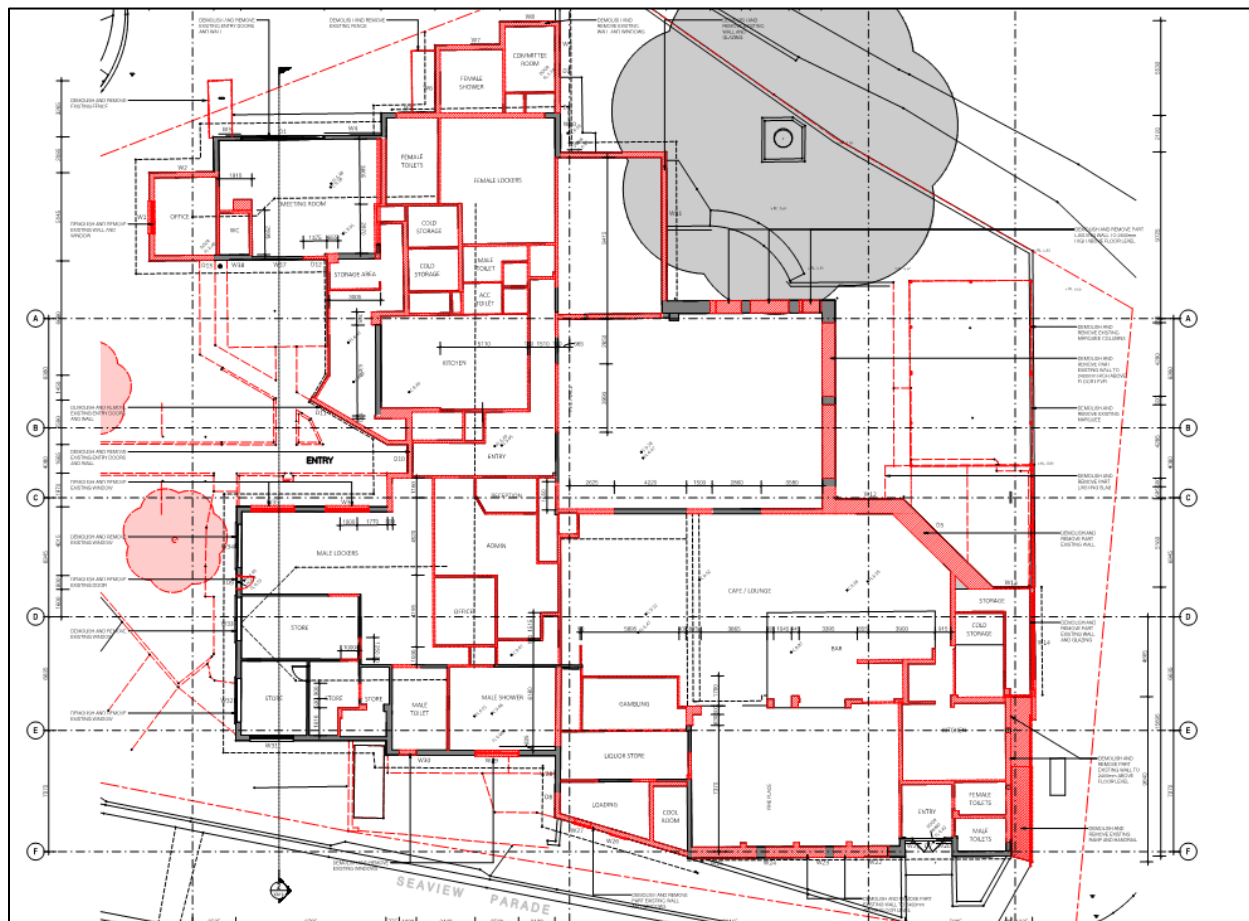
Proposed Demolition Ground Floor Plan (Source: i2C; 2025)
